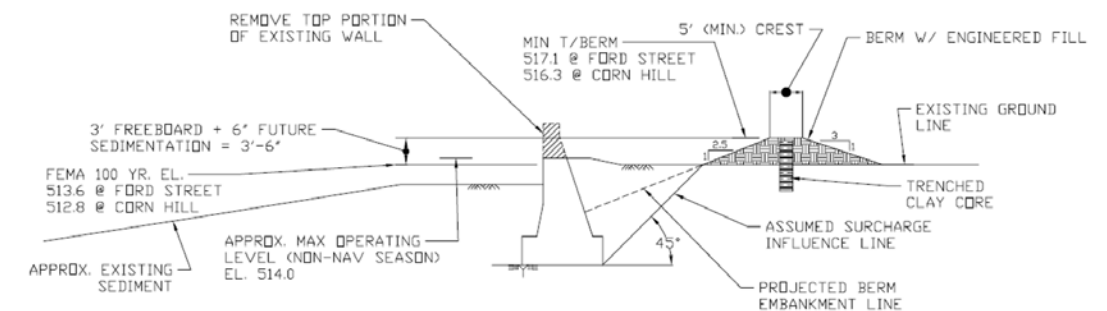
ALTERNATIVE 3 CROSS-SECTION
